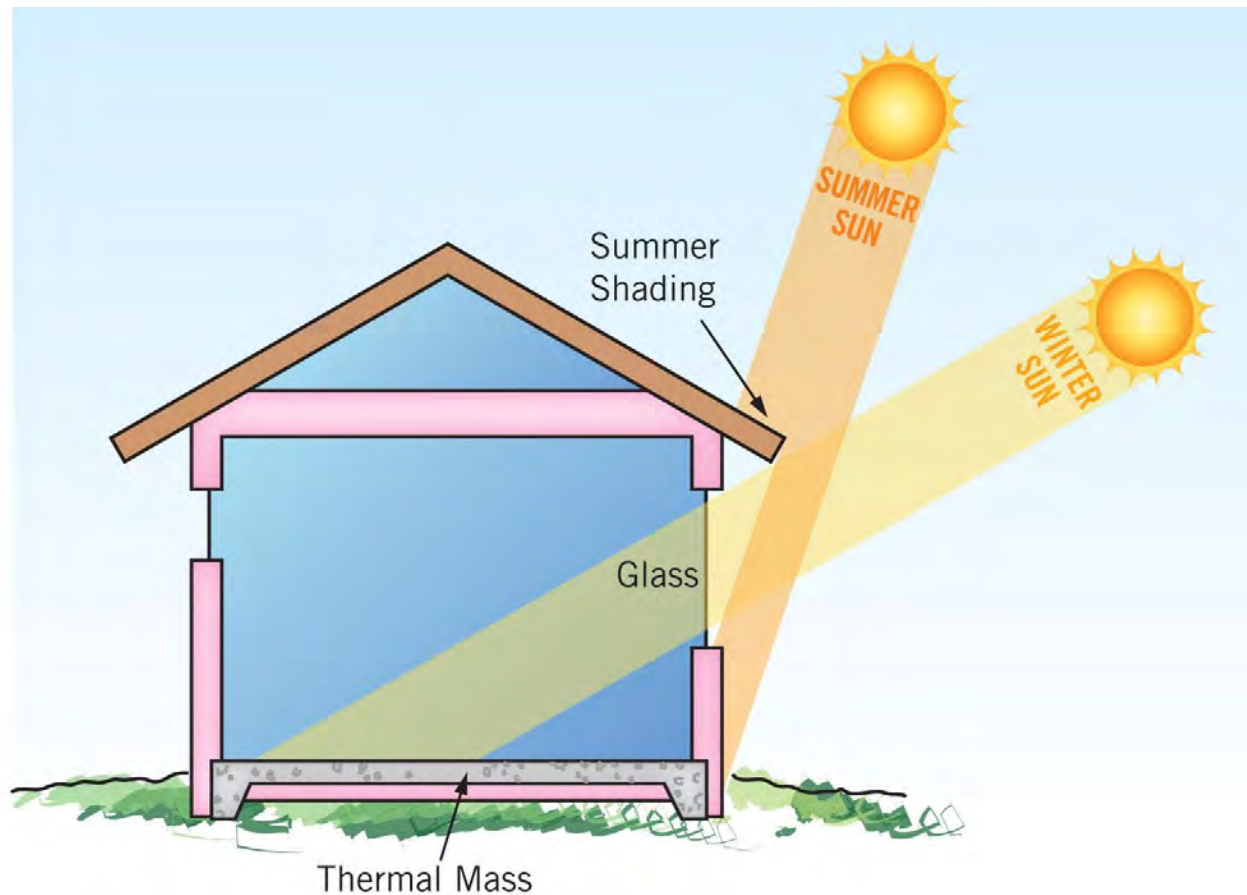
Example of Thermal Mass Slab-on-Grade Foundation
